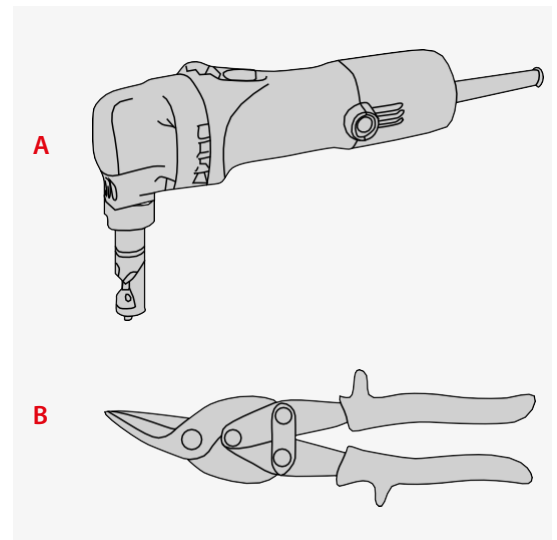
INSTALLATION TOOLS FOR THE ELEGANT 2.0 ROOF PANELS
